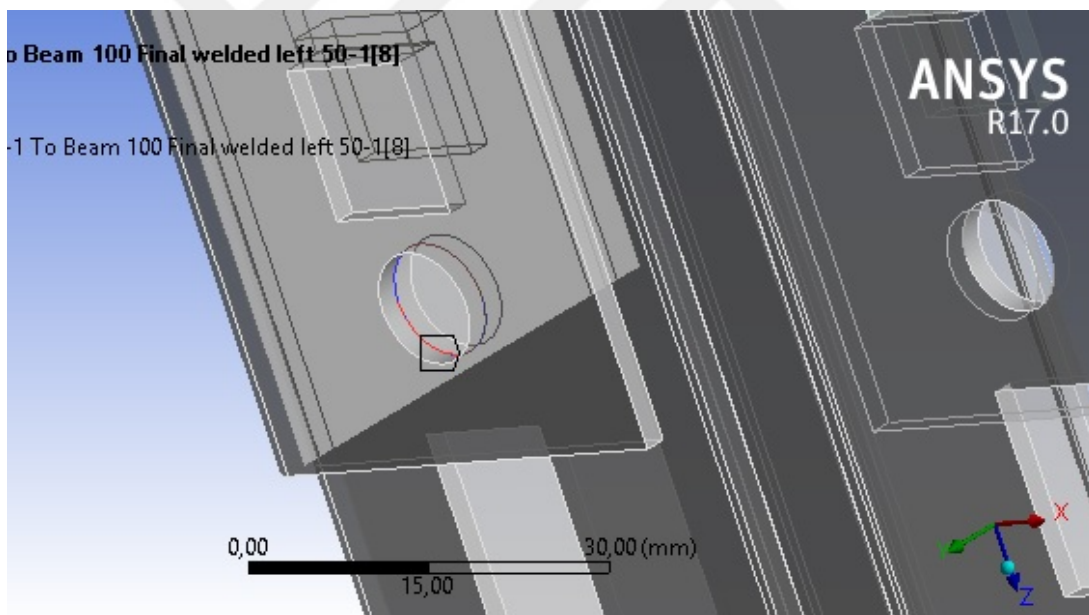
The beam-to-column connection designed in Solidworks.
